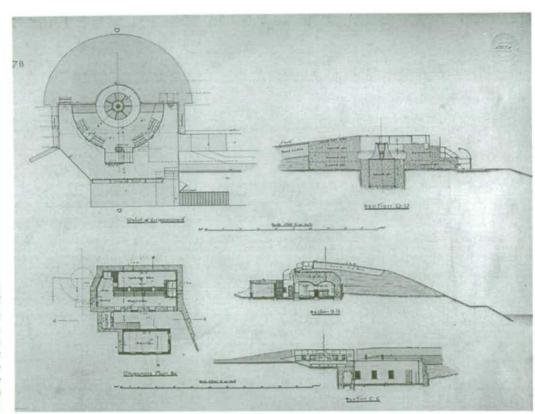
Plan dated 1901 of the new 6-inch BL gun emplacement with magazine and shelter (PRO: WO 78/4054/4)
